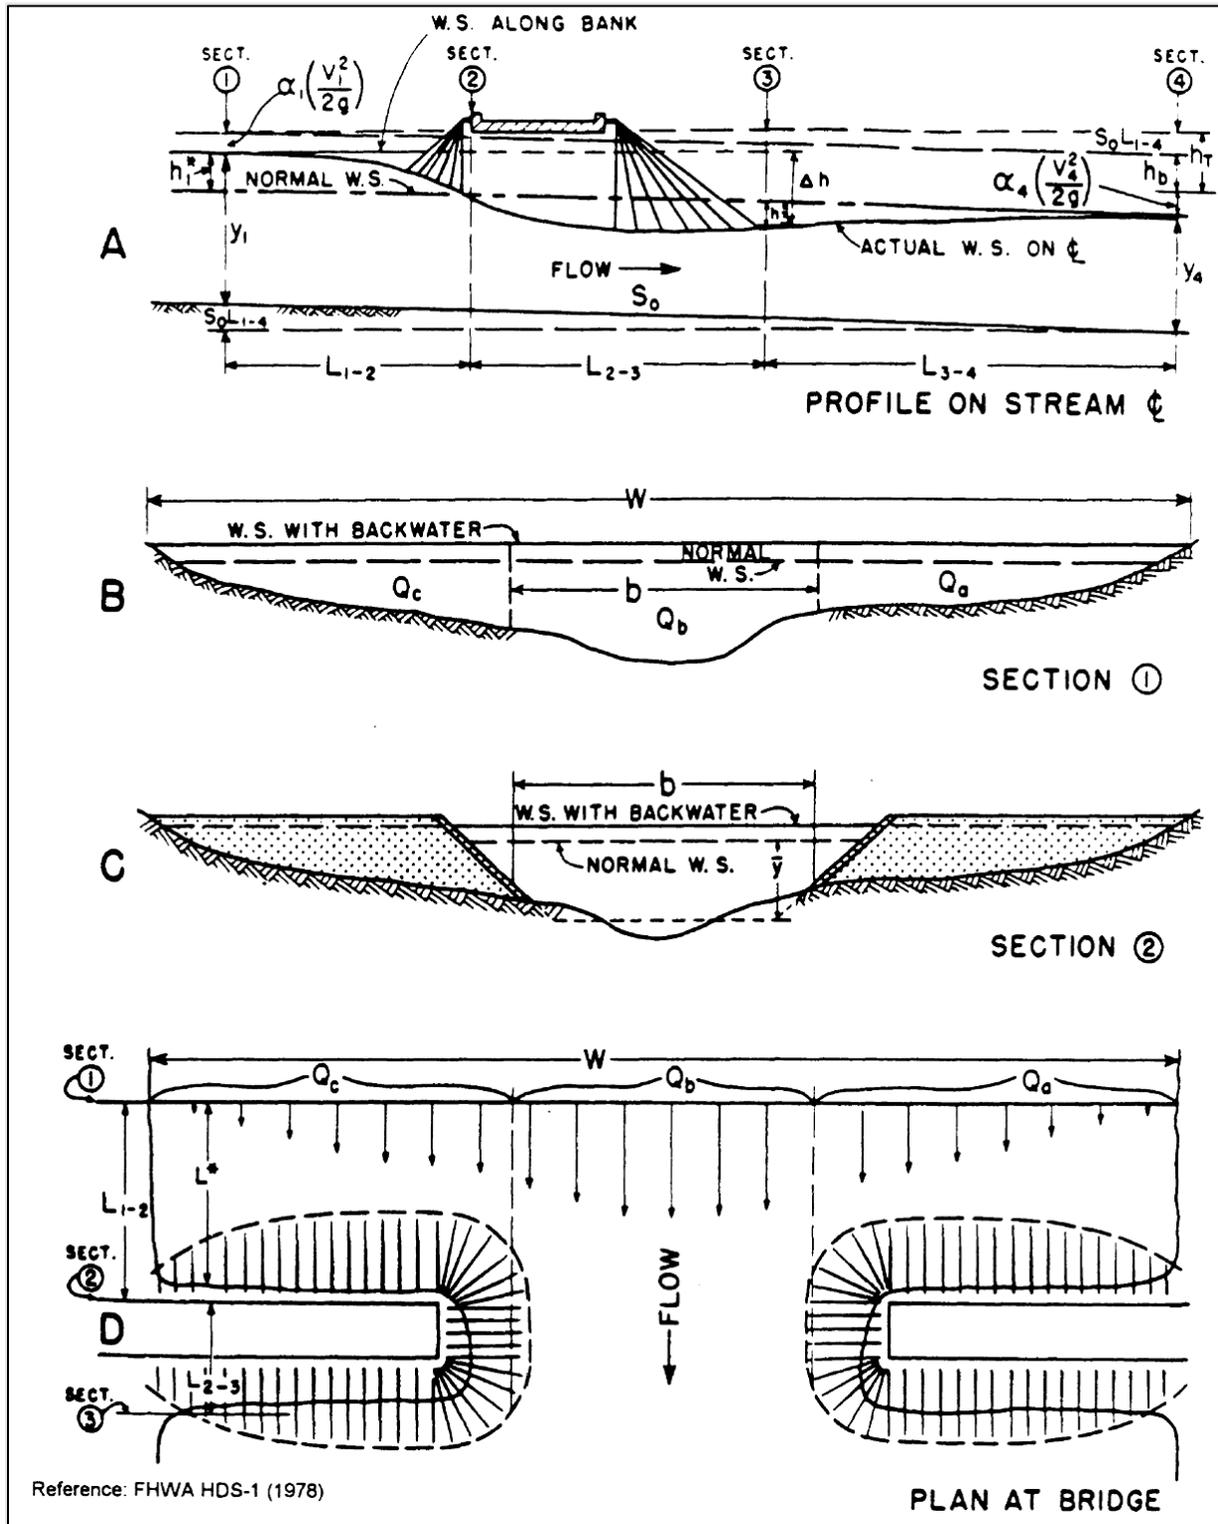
Normal Crossings: Spill-through Abutments
